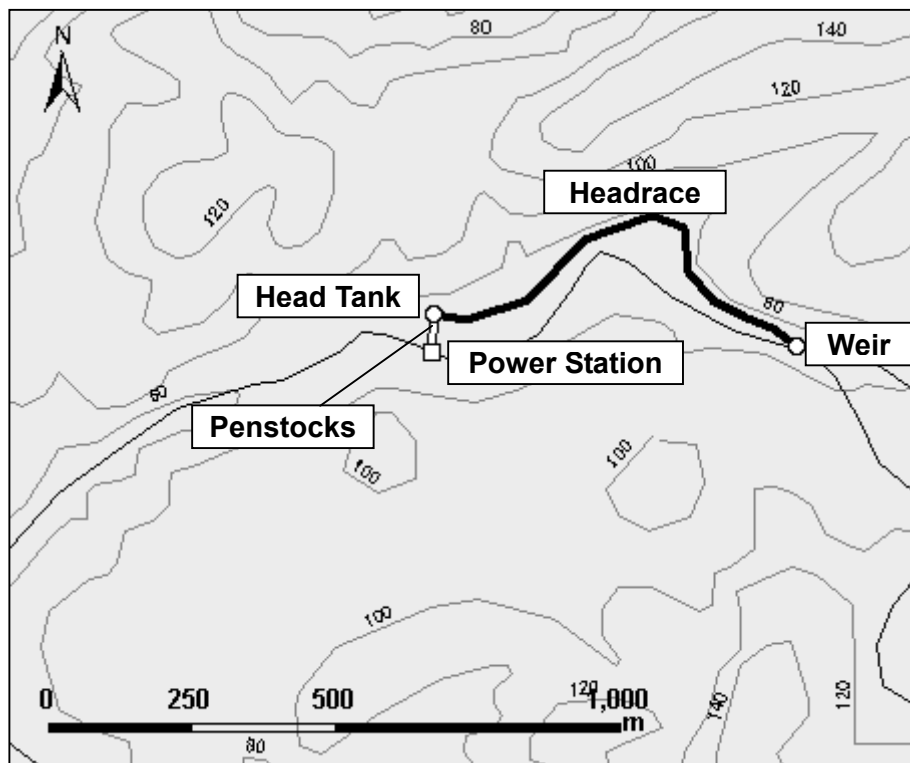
Final Civil Structure Arrangement at Aramaywan Potential Site
